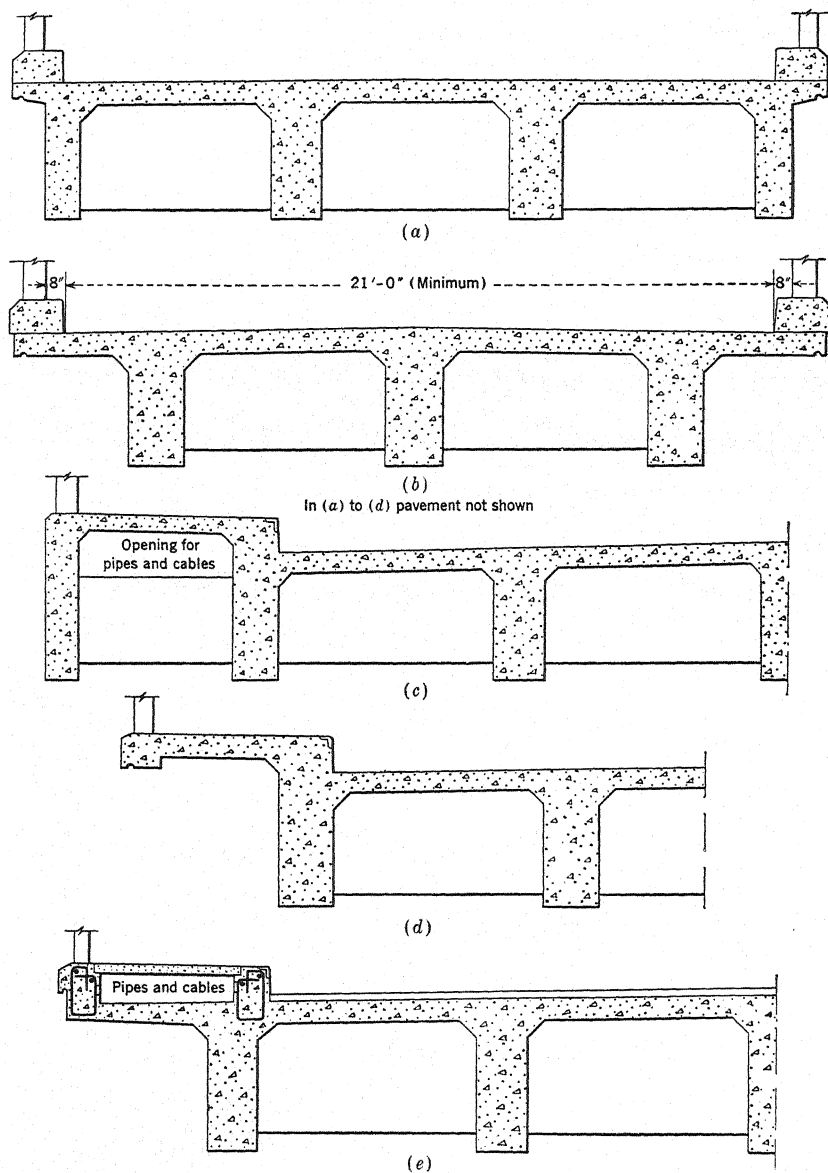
Typical Cross Sections of Deck Girder Bridges. (See p. 44.)
